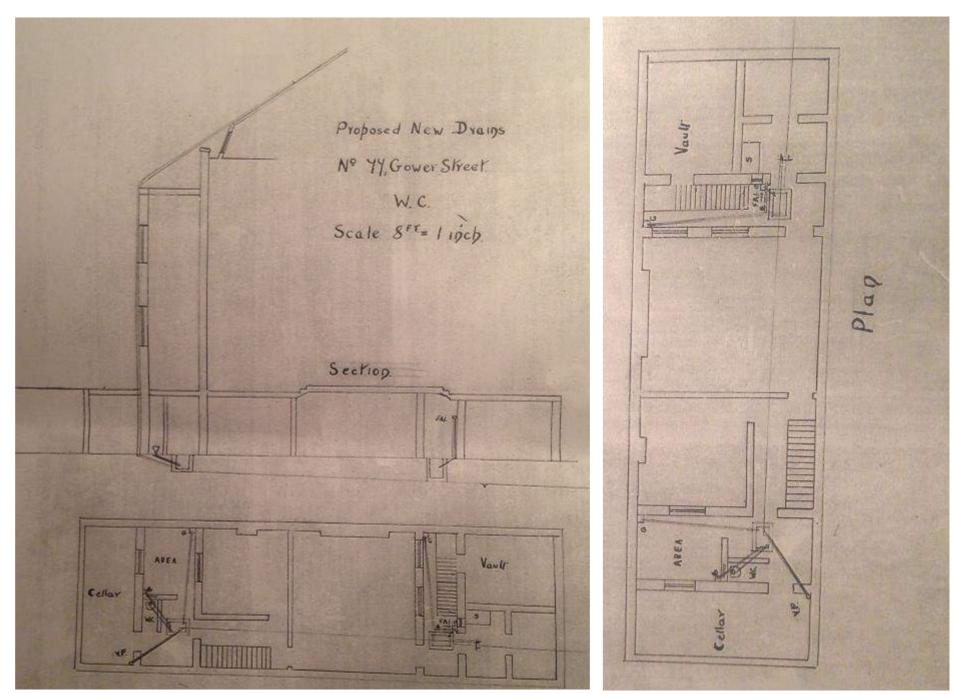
Section and plan of No. 77 showing room configuration and proposed drainage
